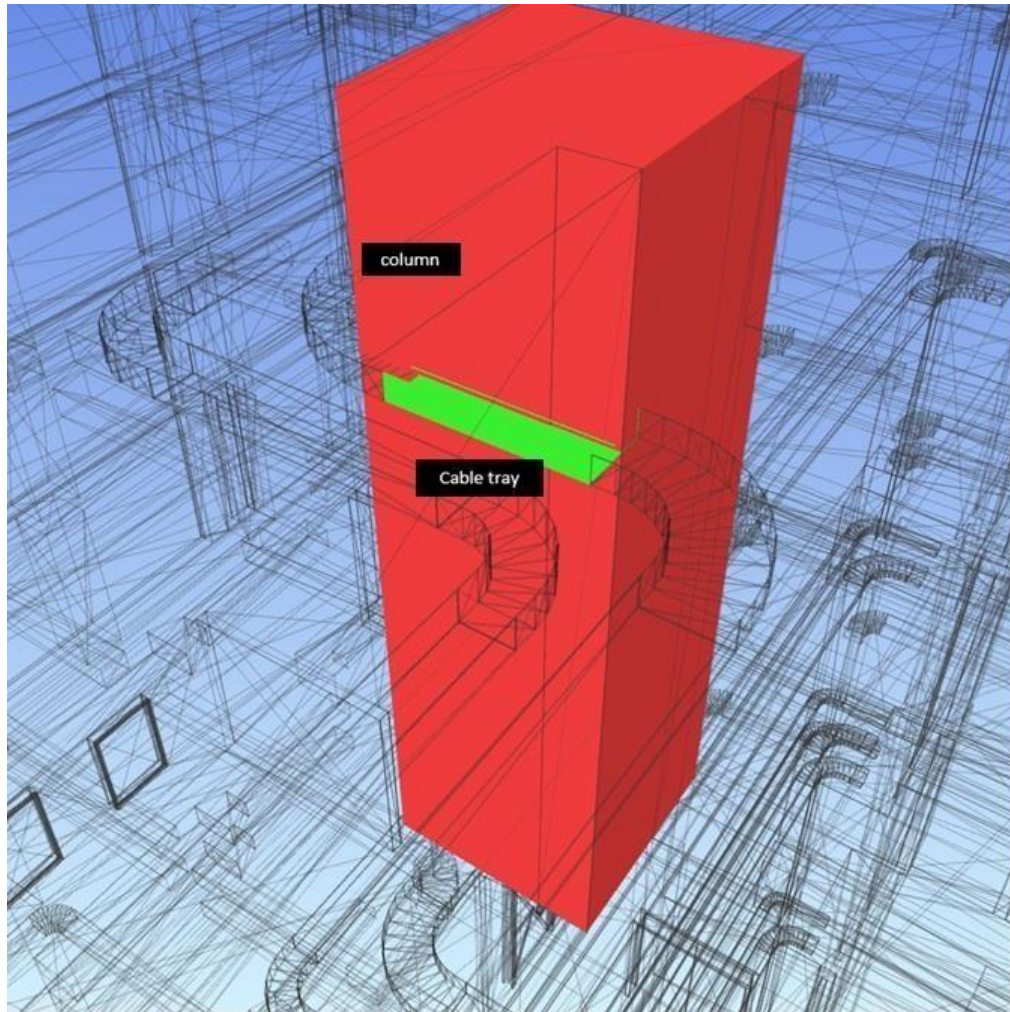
Clash between Column vs Cable tray on 3rd floor
